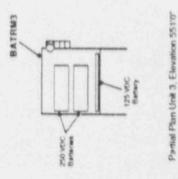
Dresden Unit 3 Turbine Building Elevation 561'-6"
